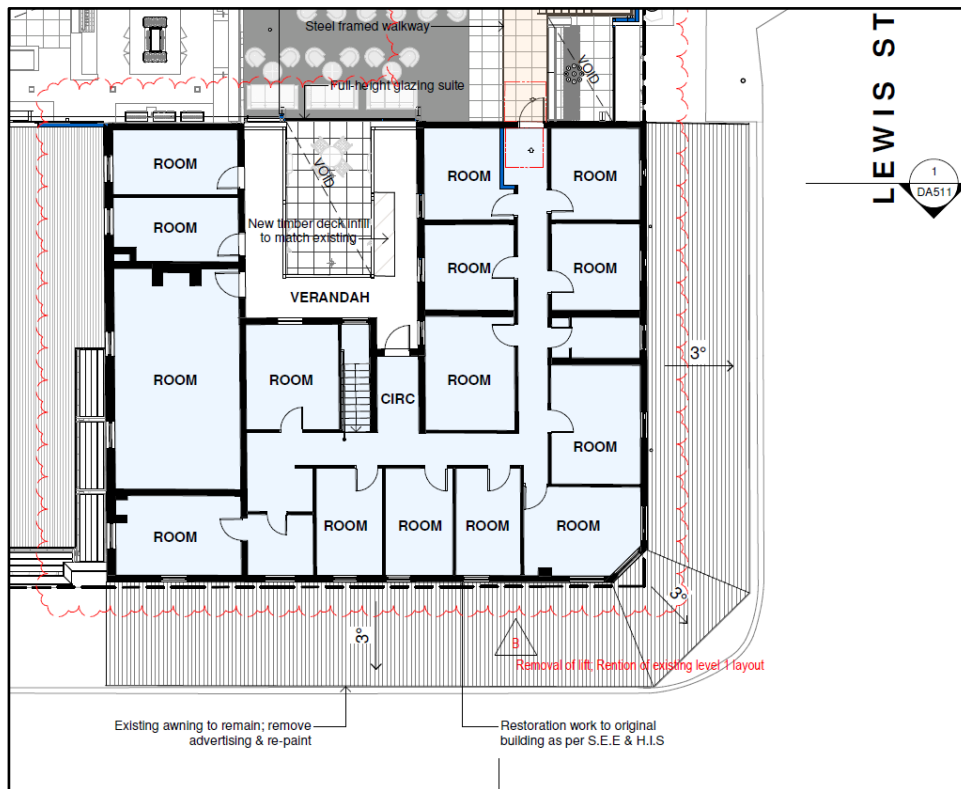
Extract from Upper Level 1 Plan of proposed modification plans showing upper floor of Federal Hotel with existing accommodation to be retained.
